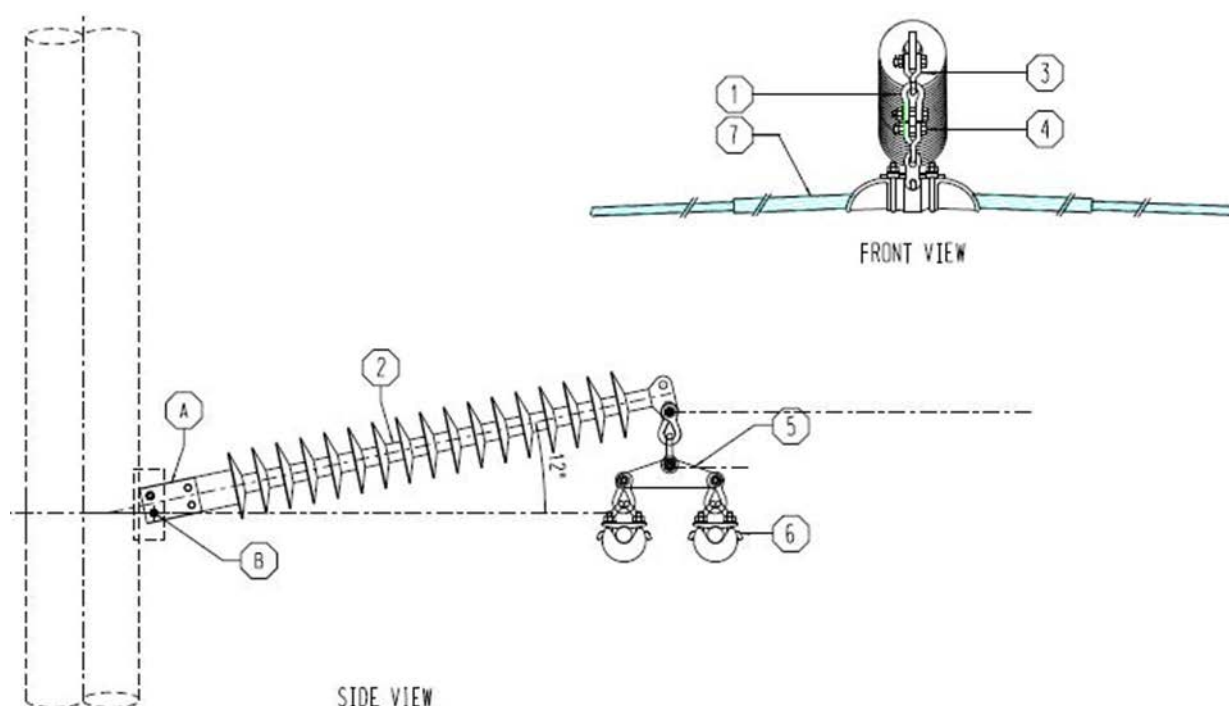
Phase Conductor Braced Horizontal Suspension Assembly for Twin “Conductor”
